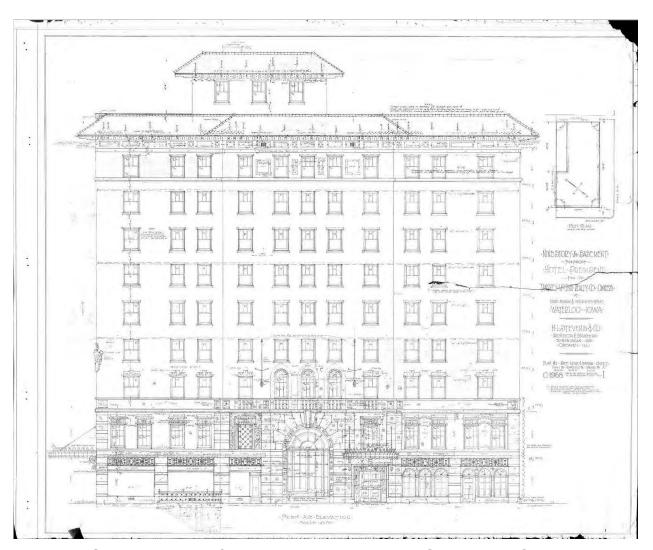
Original drawing of the West Elevation by H. L. Stevens and Company, 1928. From the collection of the building's owner, available in the management office, Park Towers Apartments, Waterloo, Iowa.
